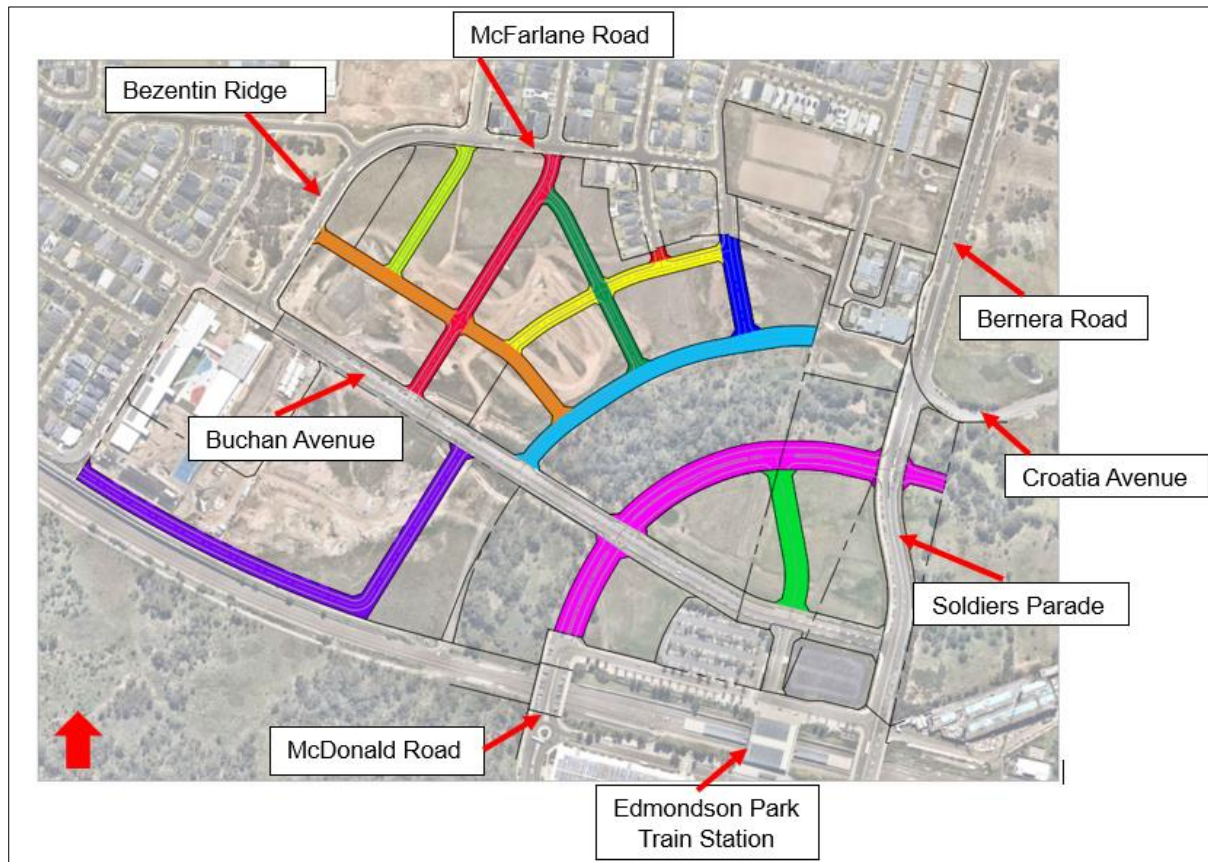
Proposed indicative only Street layout plan for Precinct 3 Edmondson Park
